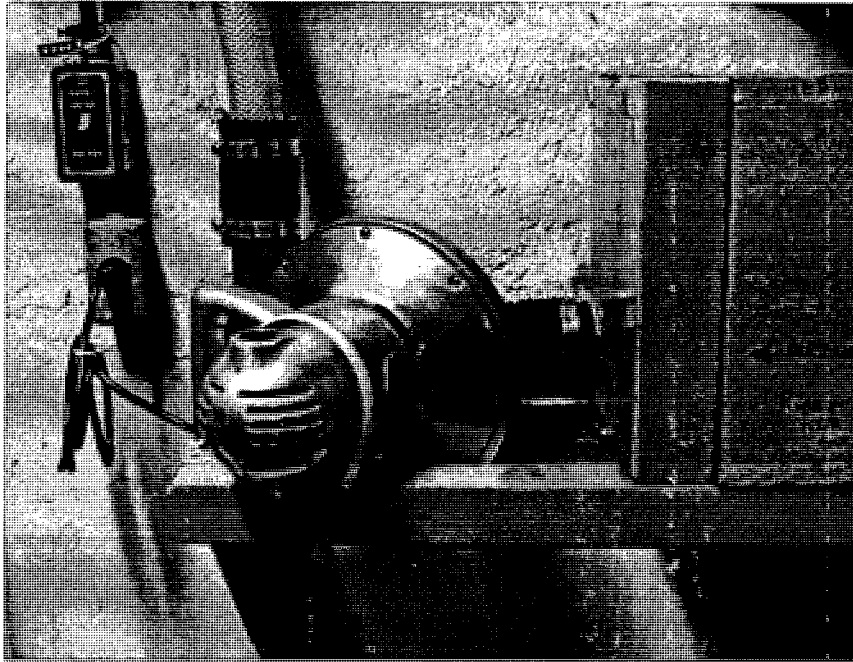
Pneumatic Transfer System Blower-and-Filter Assembly
